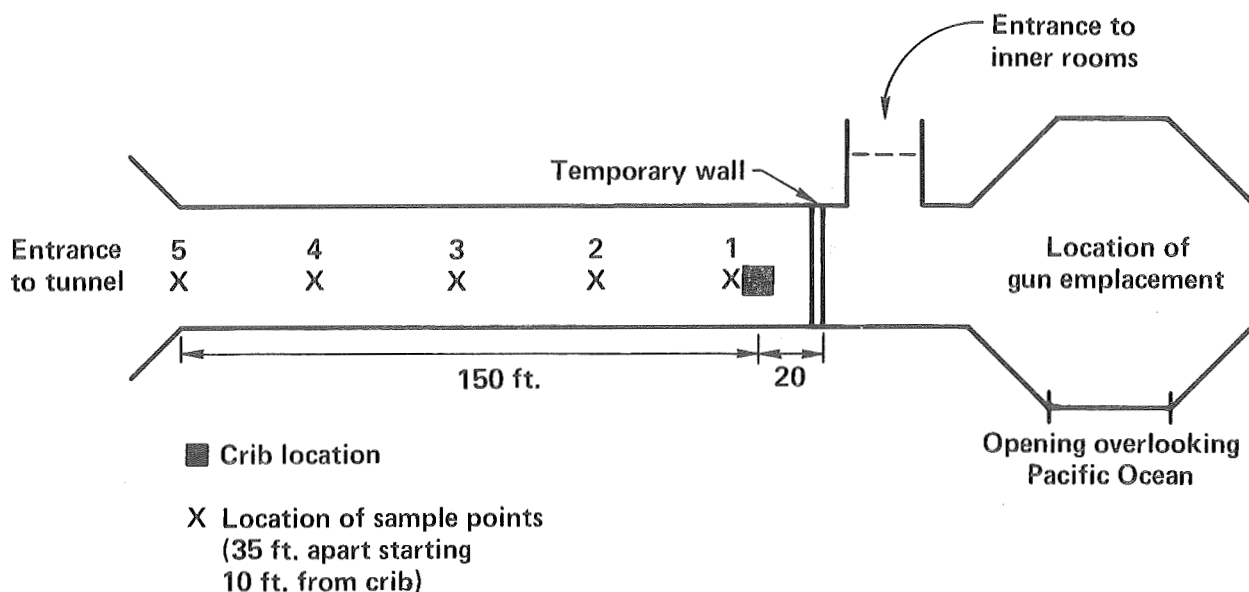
Drawing of experimental tunnel showing location of crib, sample station, and temporary wall.
